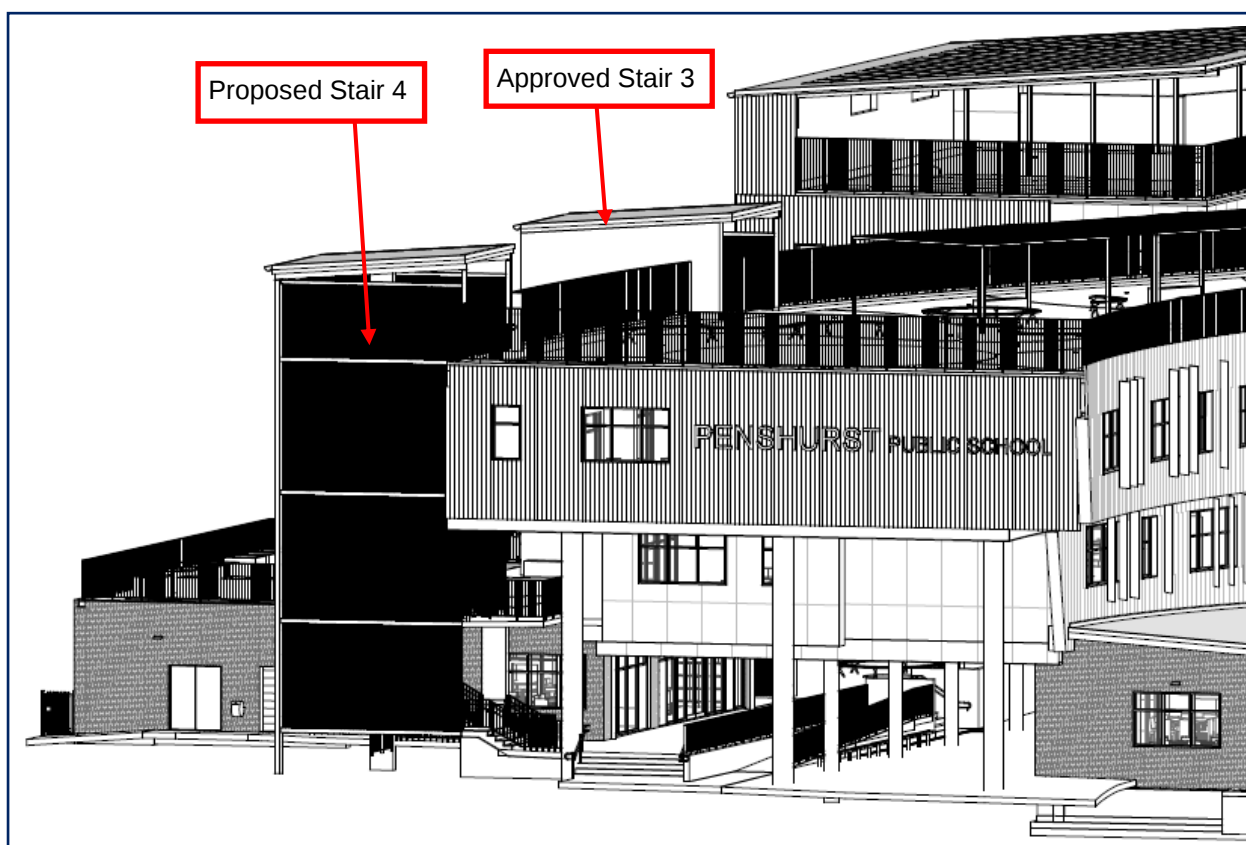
| view looking north to the southern end of the school building (Source: Applicant's modification application 2020)
